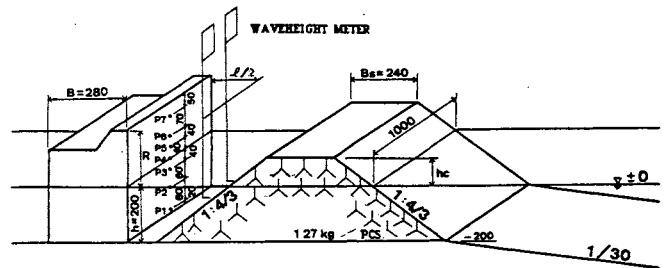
Model Structure of Submerged Embankment unit: mm
